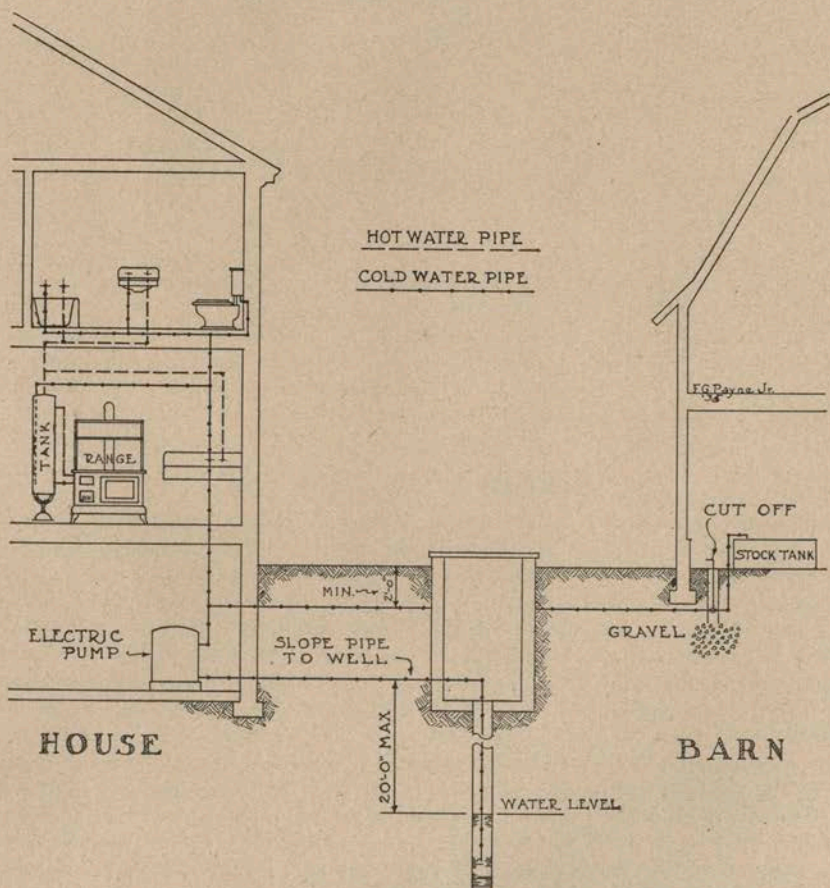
Typical shallow well pump installation. The same general arrangement is applicable to the centrifugal jet pump installation in wells up to 100 feet deep.
